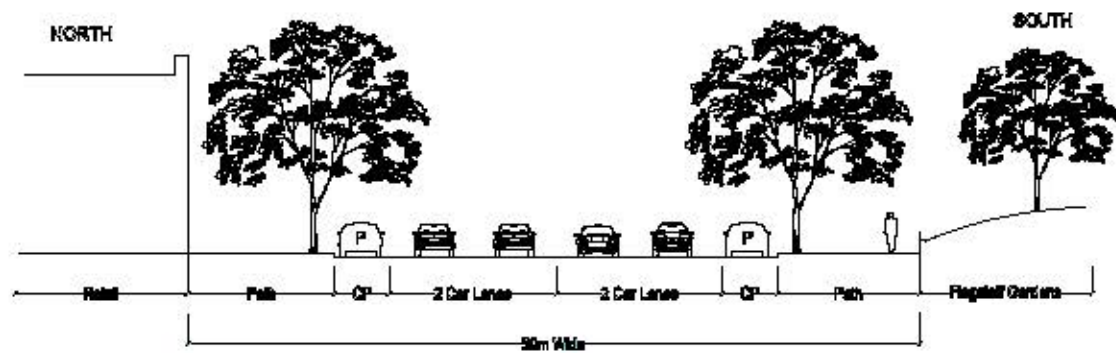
Indicative Dudley Street section between King Street and Milton Street looking east.
